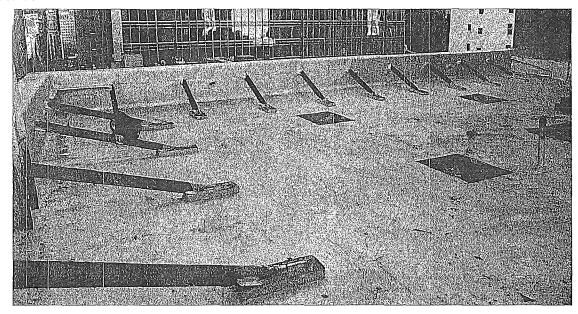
Photograph of built-up roof, looking east. Diagonal seismic bracing supports parapet walls (photograph taken on 02/27/2018).
